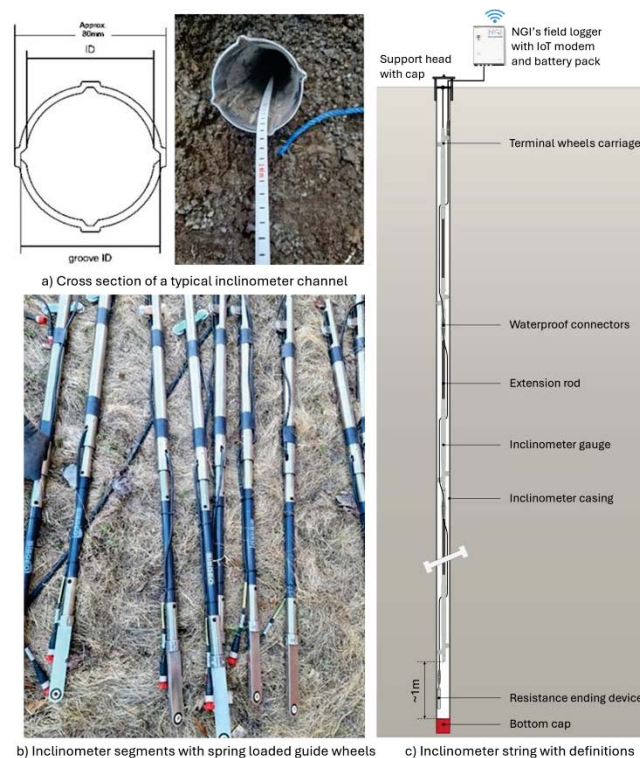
a) Picture and cross section of inclinometer channel, b) Picture of inclinometer segments with spring loaded guide wheels and c) vertical cross section of inclinometer string with definitions of the different elements.
